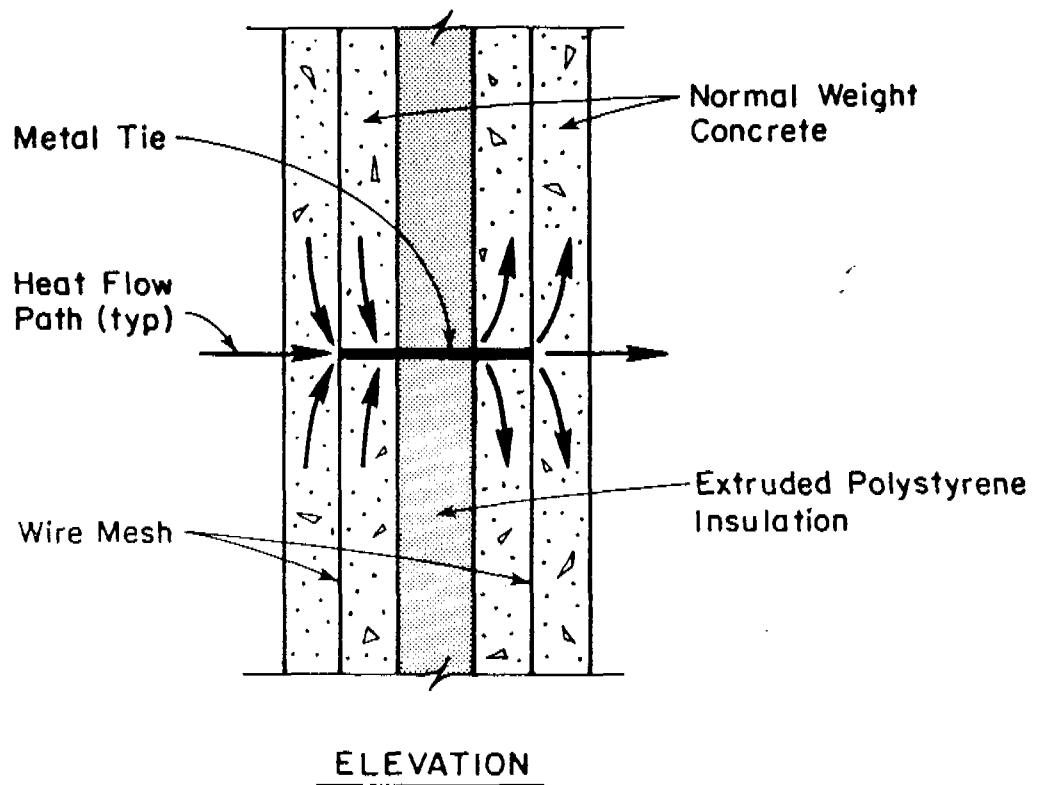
Thermal Bridge Through Insulated Concrete Sandwich Panel Wall
